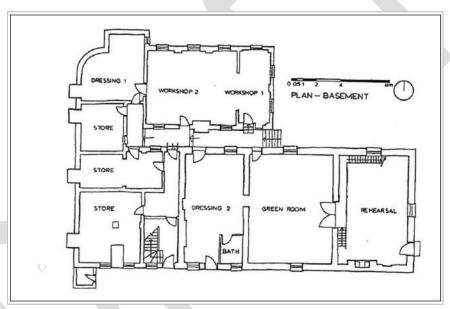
Basement plan, showing the configuration of the building in 1990. (Source: Bligh Robertson Architects, Sydney Sailor's Home (former) (106-8 George Street) Conservation Plan, (Feb 1990))
